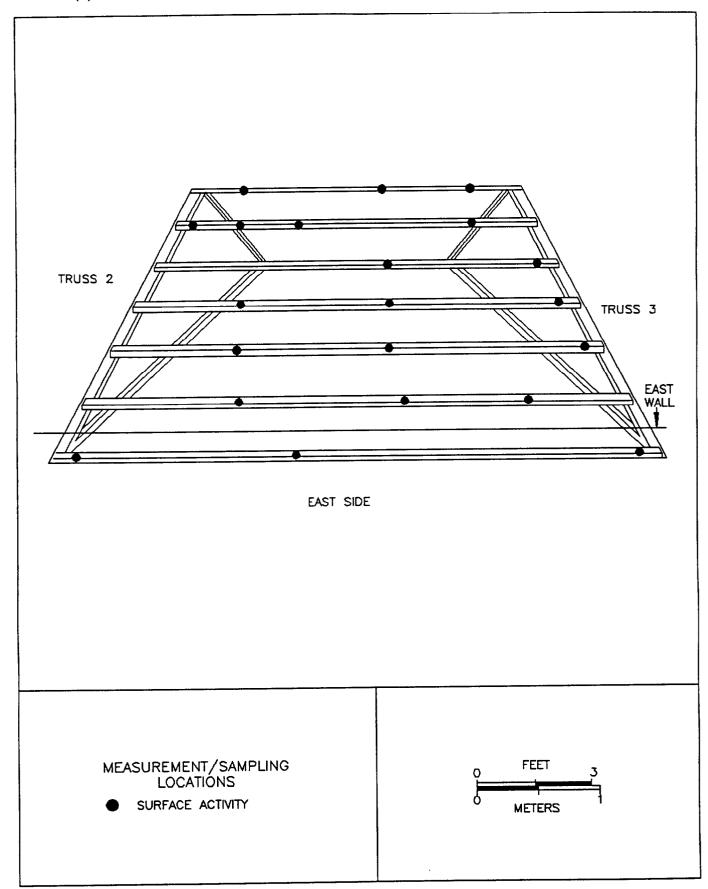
Building 8, Bay 2, East — Measurement and Sampling Locations
